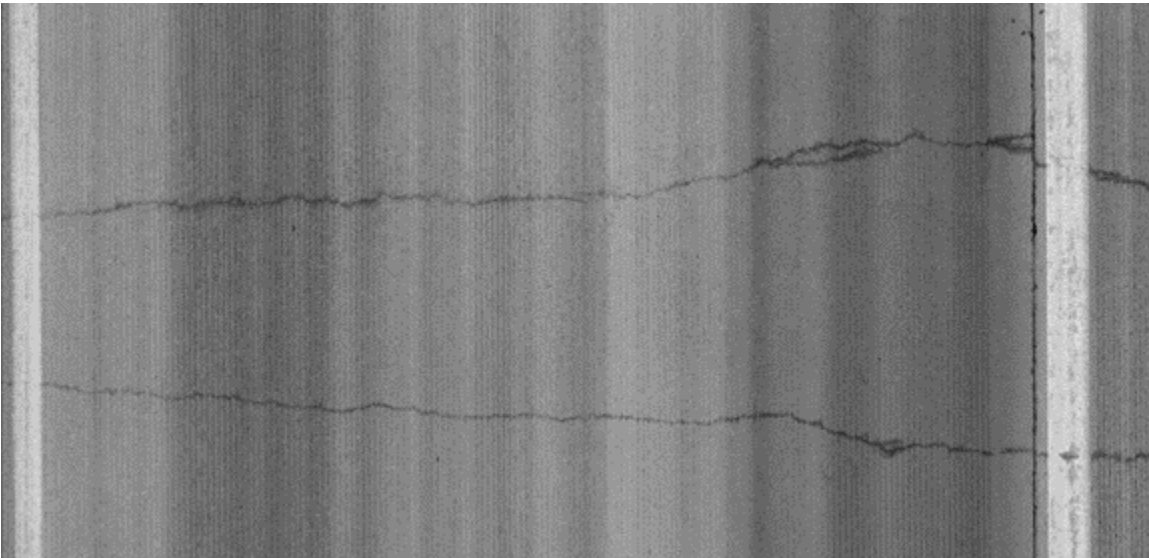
Moderate-severity transverse cracks on CRC pavement [IL 390 westbound, approx. MP 13.343].
